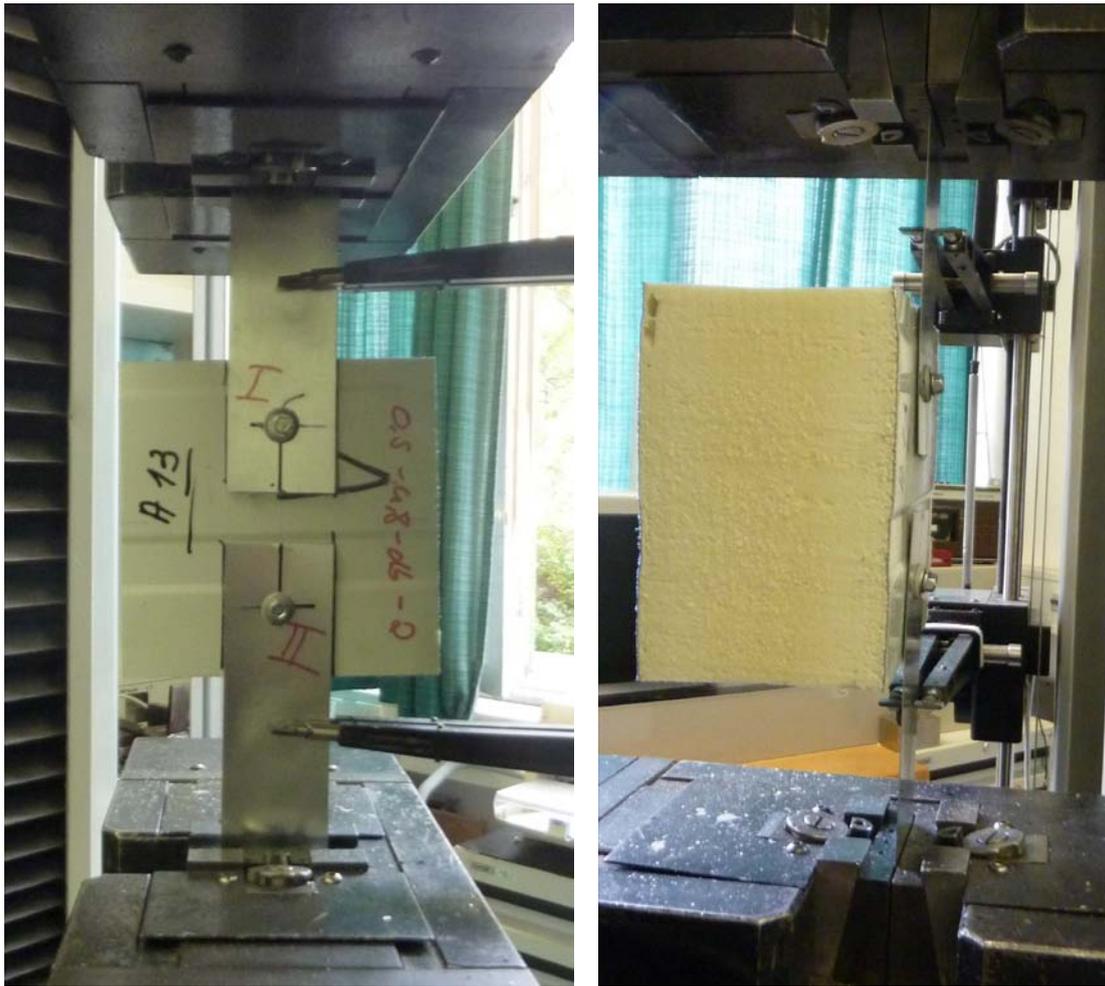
Test set-up of tests on fastenings of longitudinal joints
